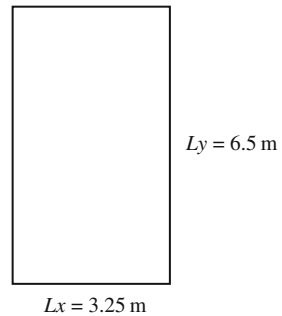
Loading area of the roof slab. (a) Slab depth
